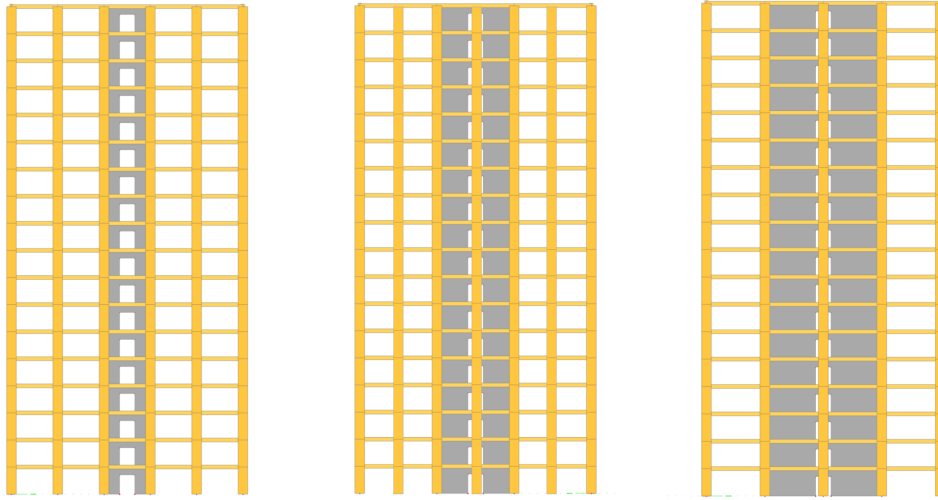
Side Views of base model for floor plan A, B & C, from left to right
